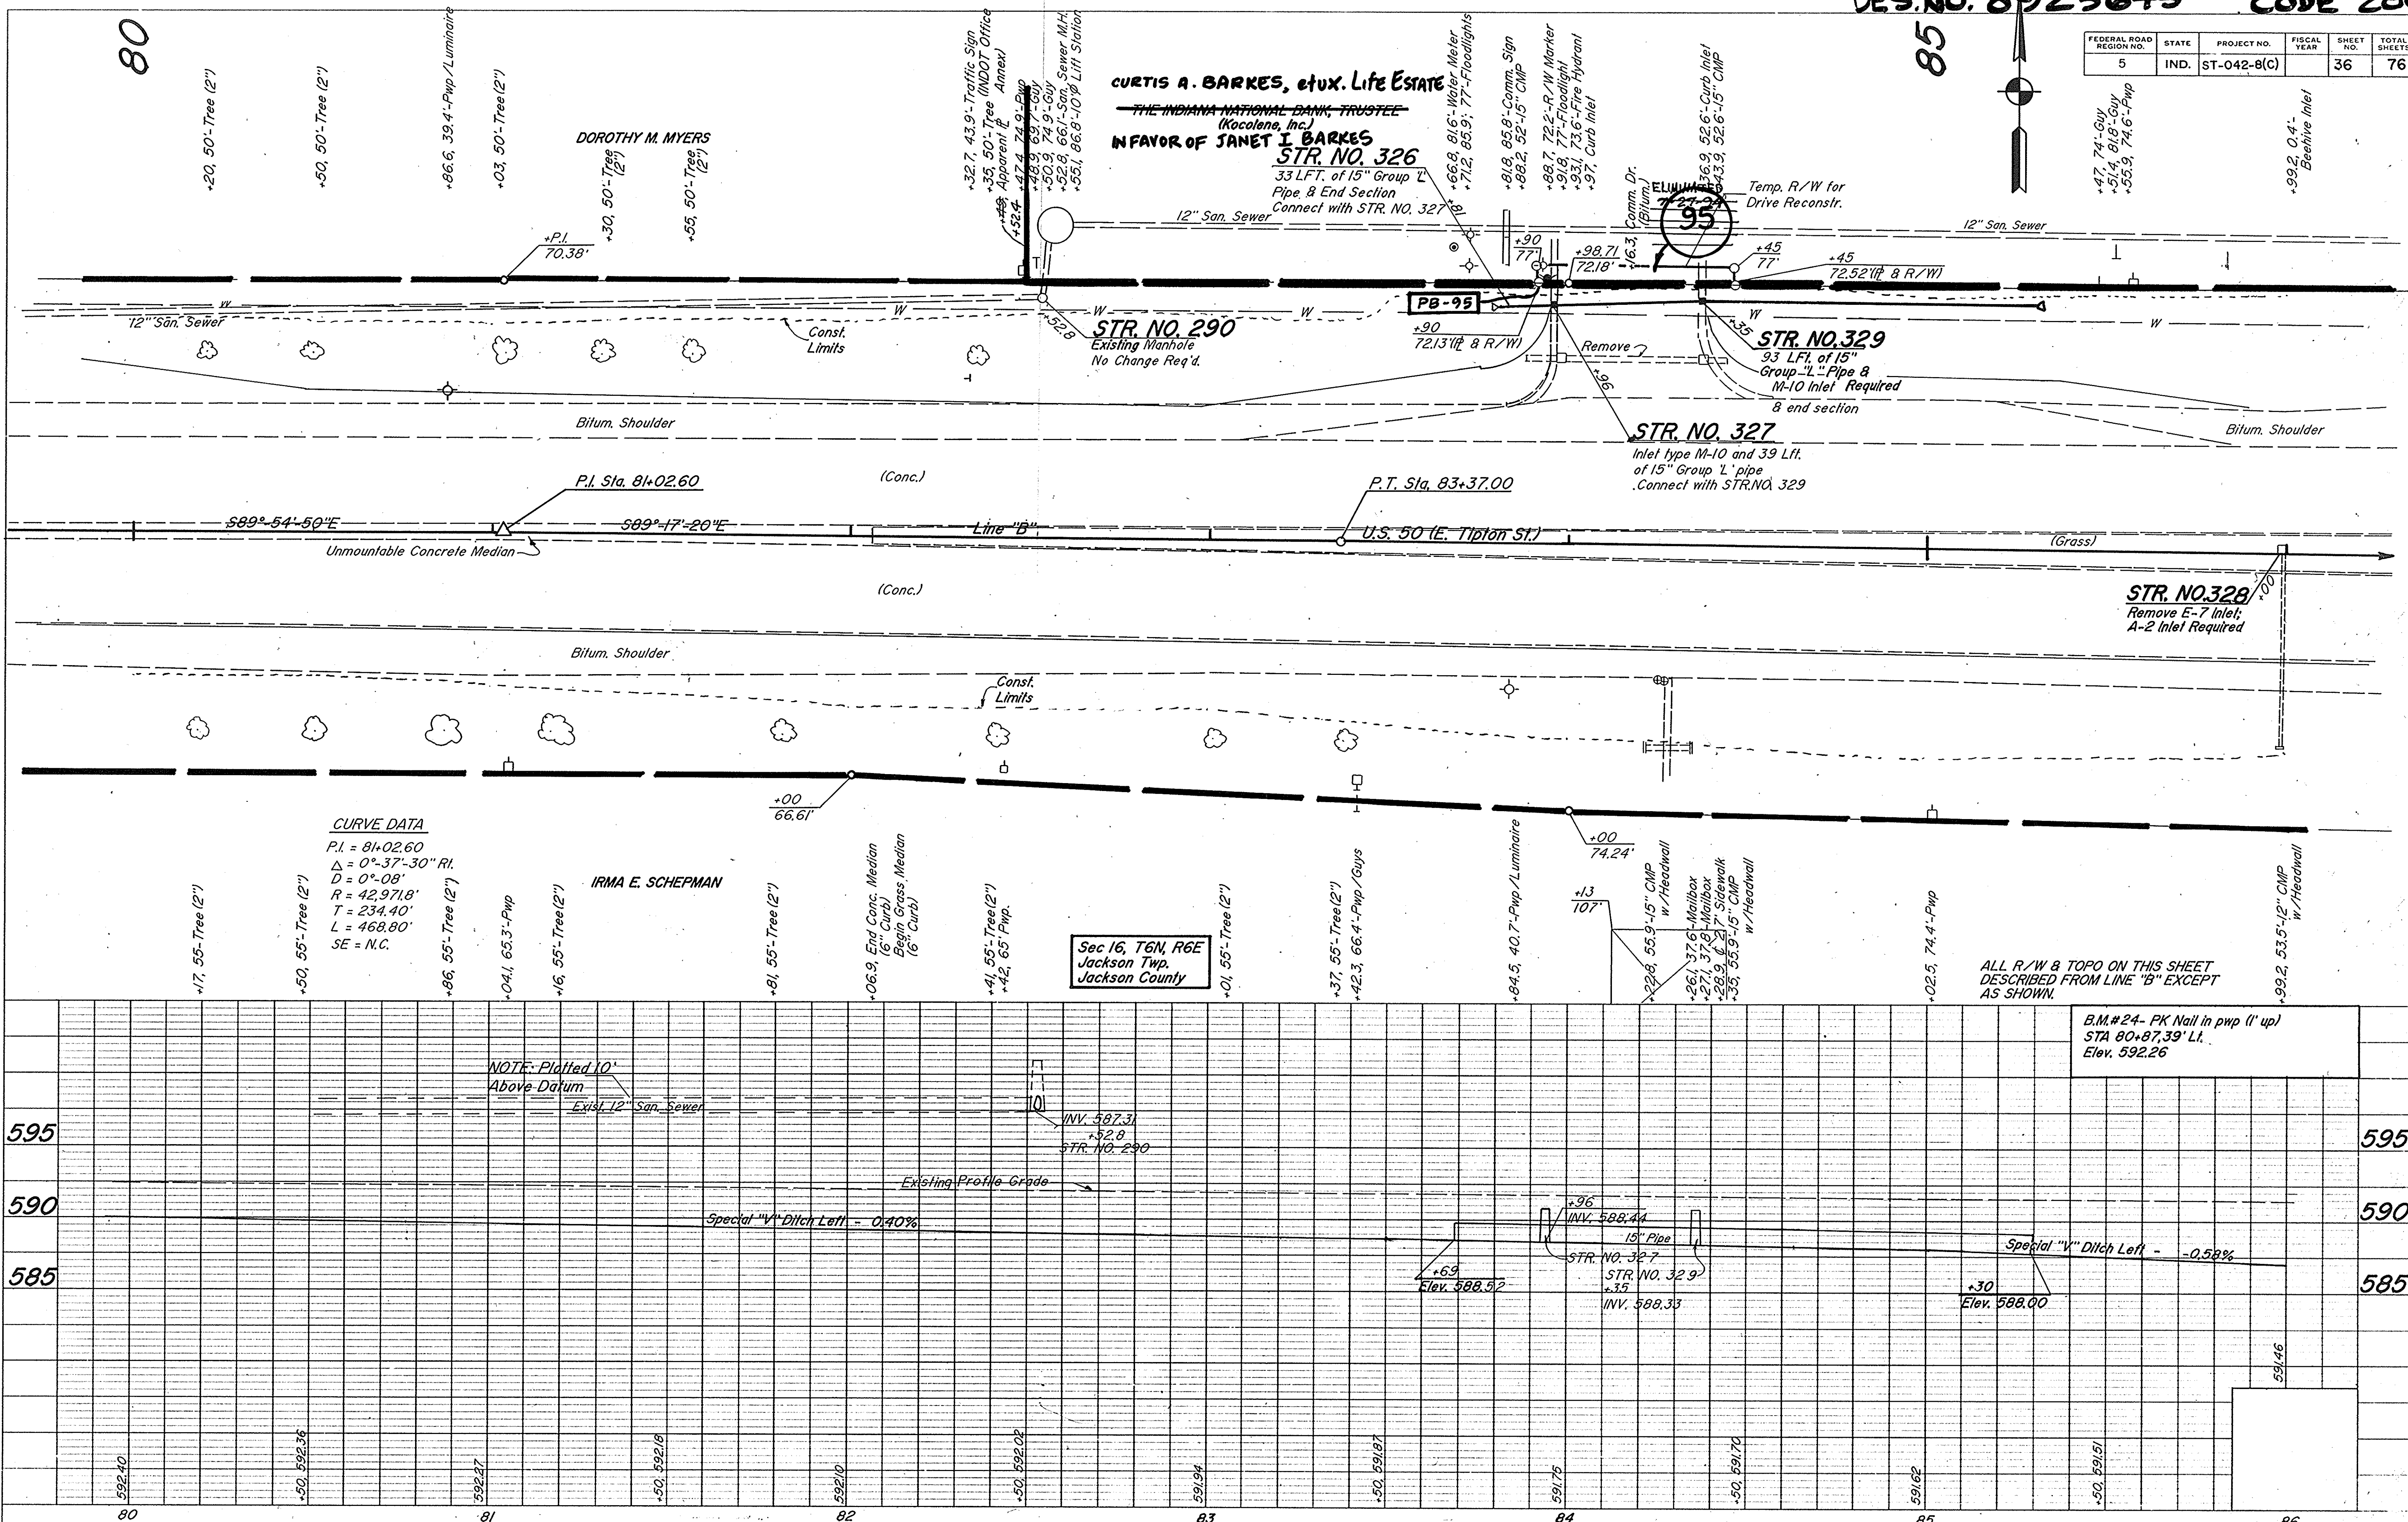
PLAN - PROFILE G. R. R. STANDARD
